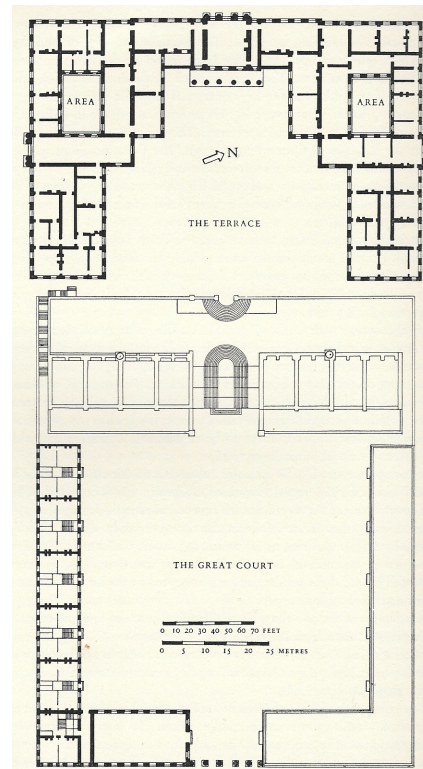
Winchester Palace. Incomplete plan based on Wren's drawings (Image: Summerson: *Architecture in Britain*.).
